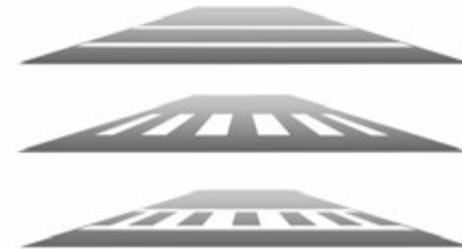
Drivers view: bolder crosswalk lines and hatching are more visible
